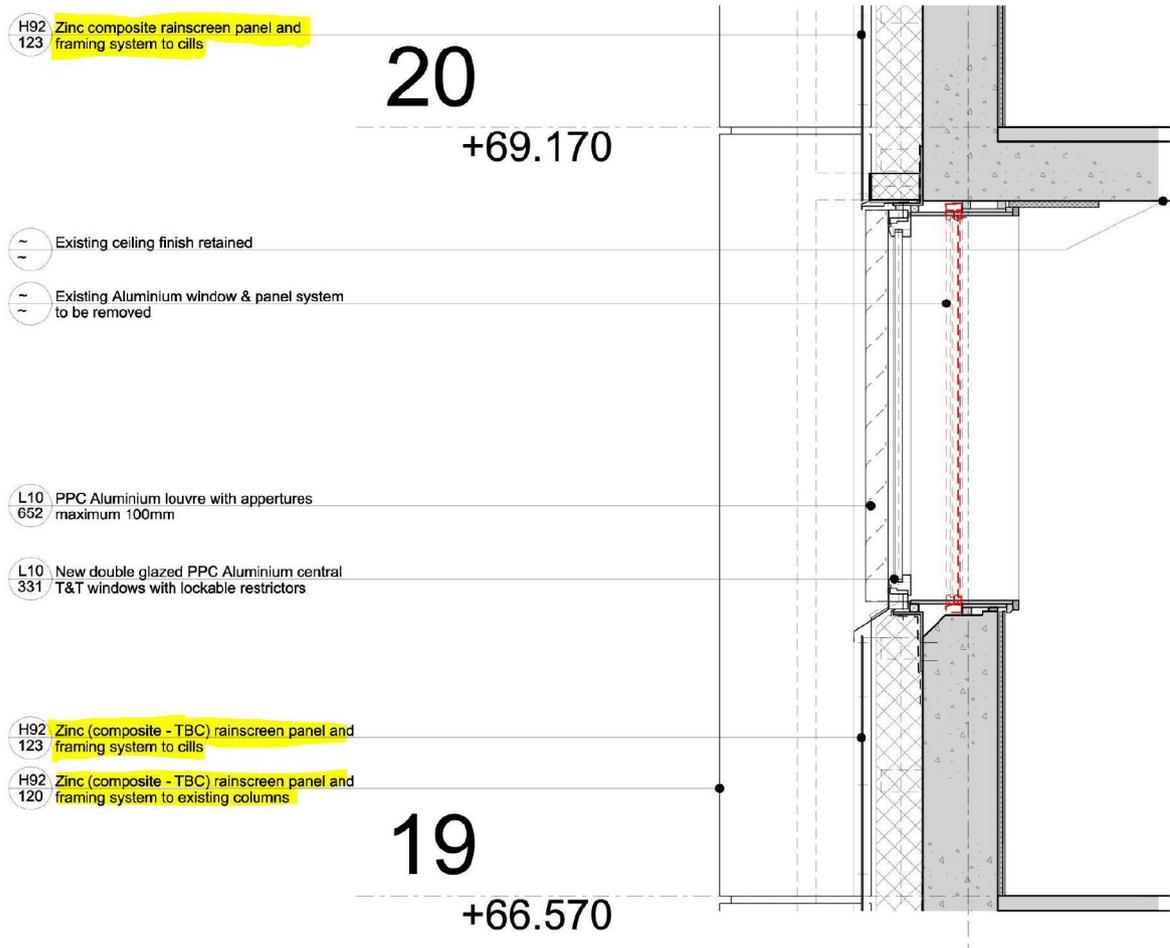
Extract from Studio E drawing 1279 (06) 120 'Detail Section Sheet 1' {SEA00003436}
